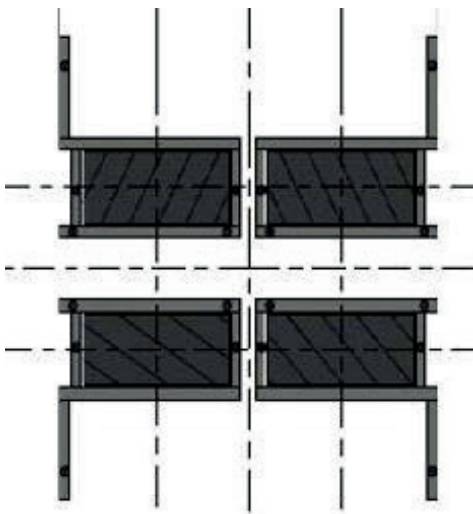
Schematic of the bearing pads and retainer plates installed on top of the pier cap.
